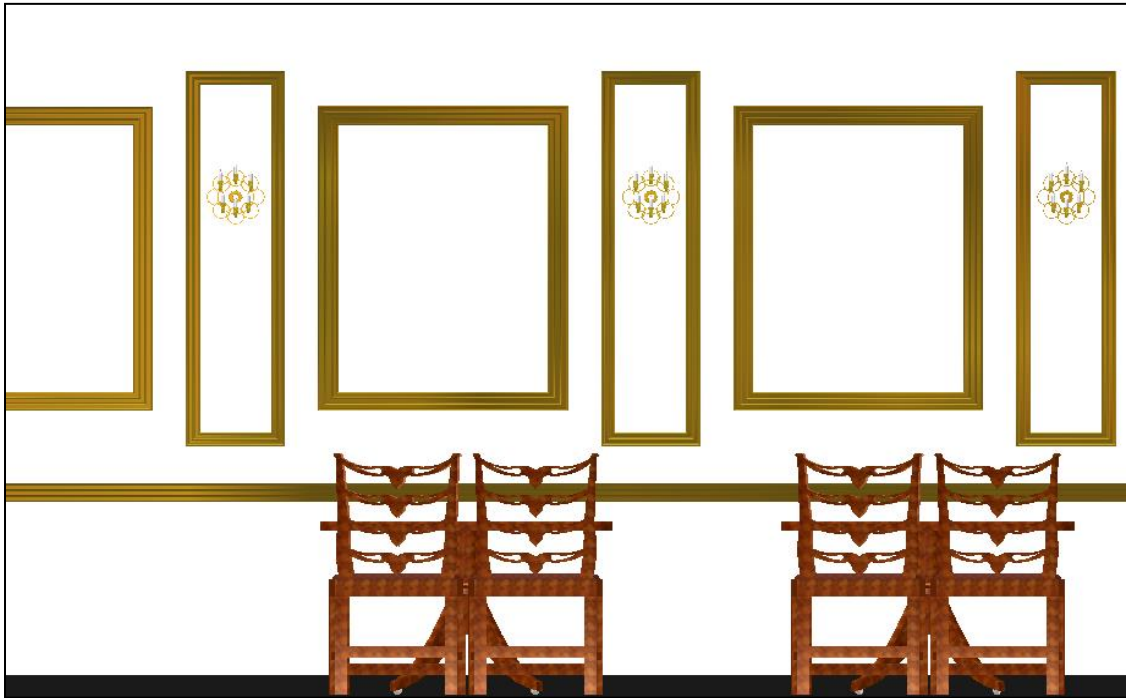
Front Wall Elevation of the Seating Arrangement of Eastern Wall
